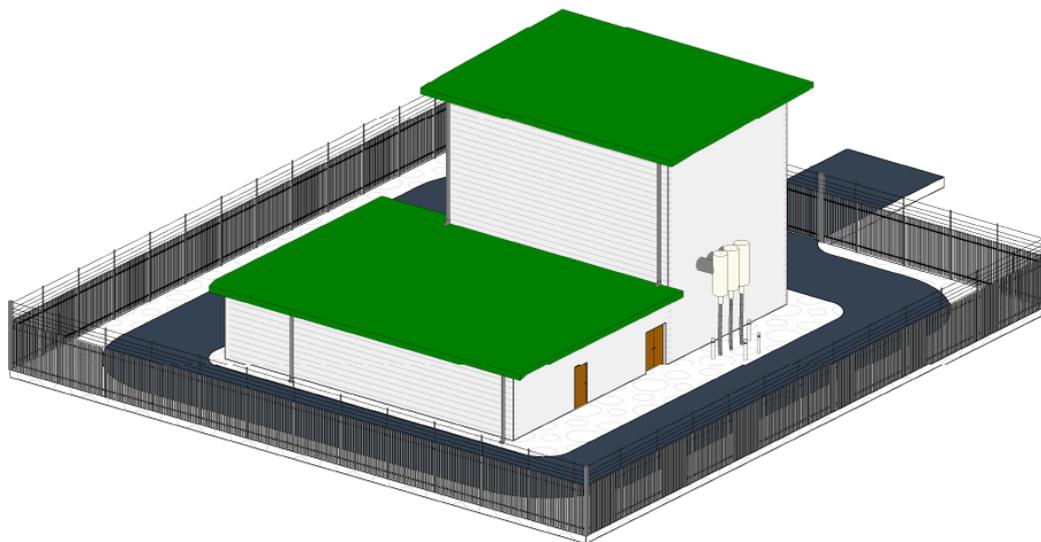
Tail Station 3-D View (source: WSP | not to scale)
